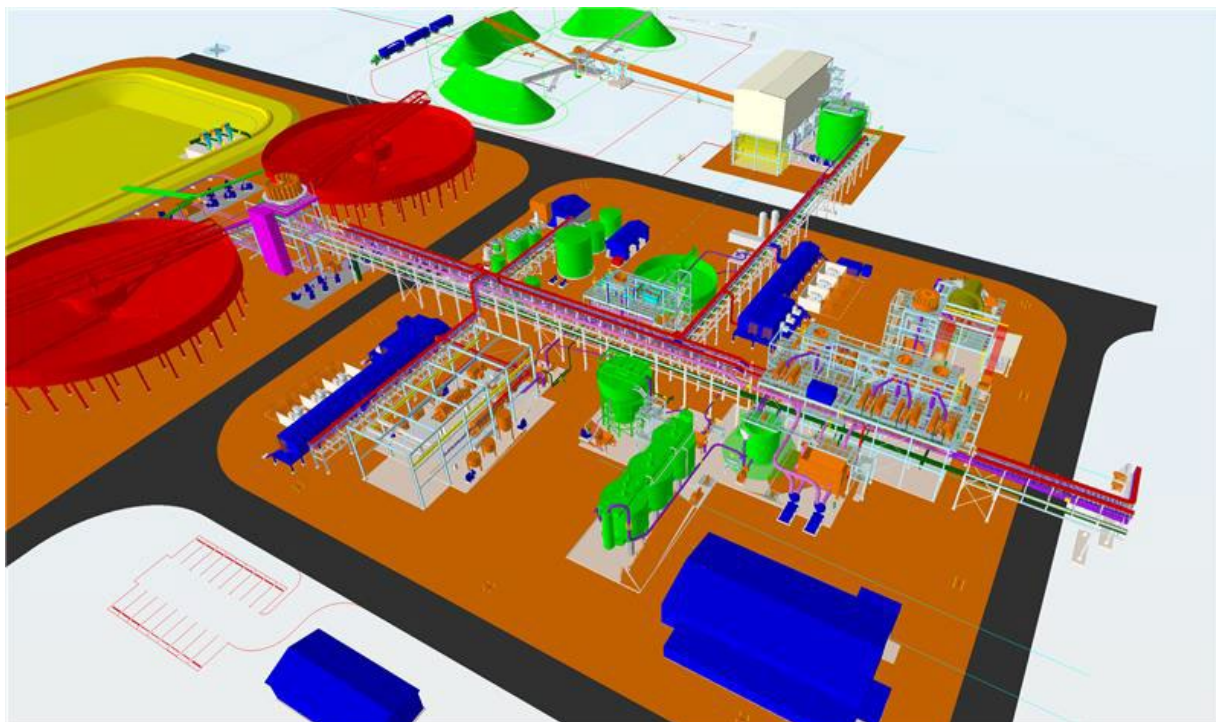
Schematic 3D design of Wet Plant section for single plant module
